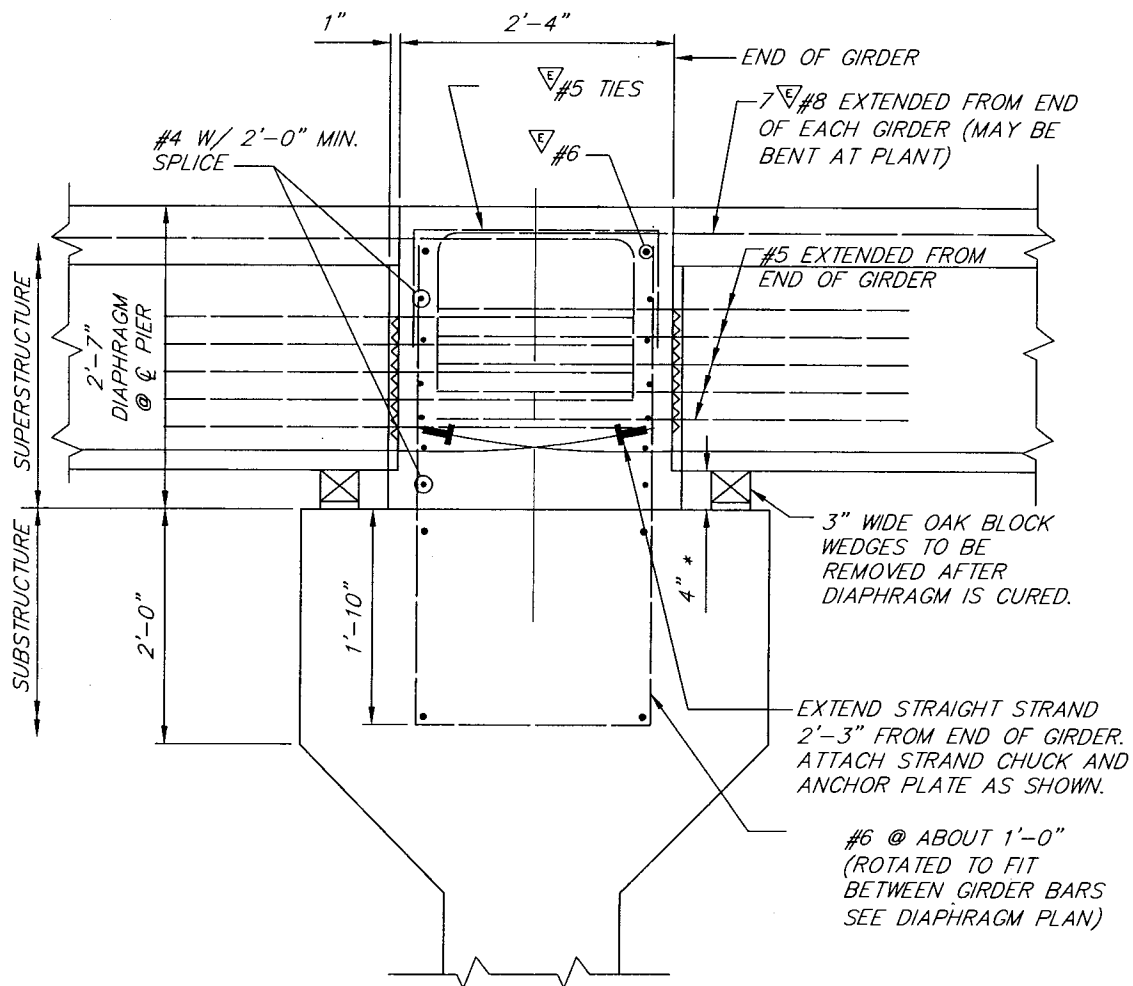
Concrete pier diaphragm used by Washington State DOT
